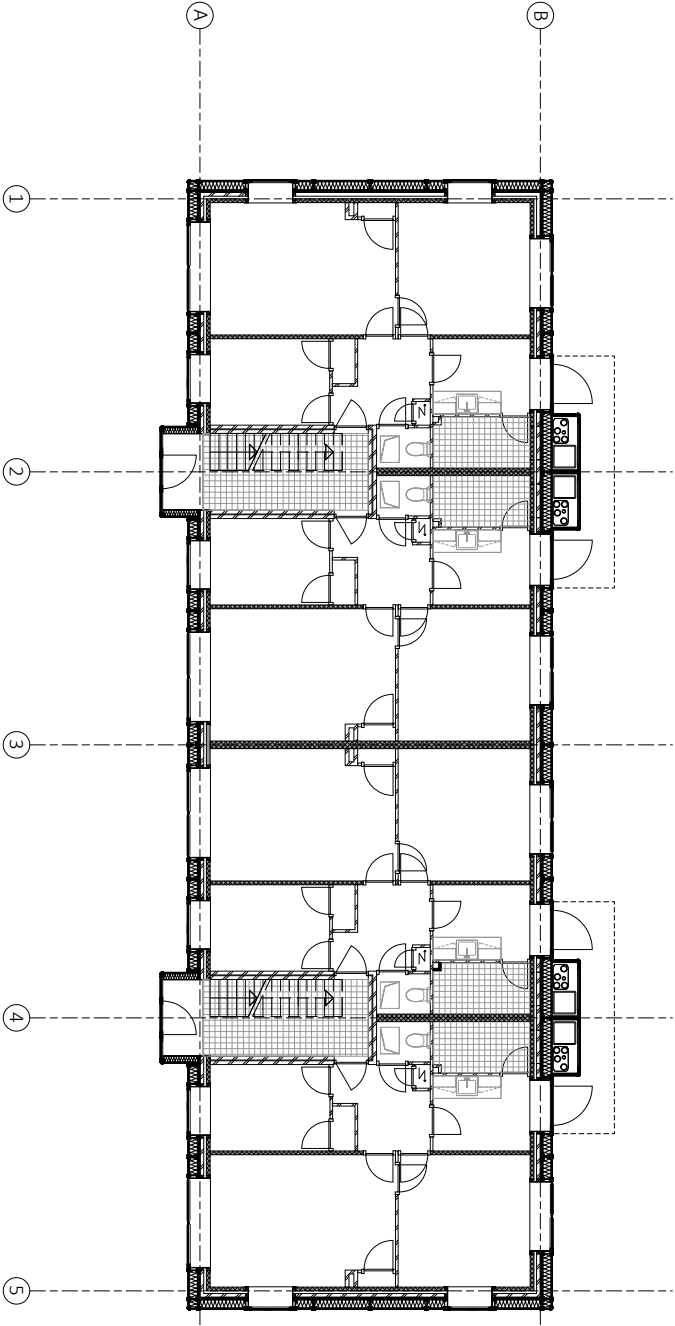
Plan | 1:200 | Ground Floor (own illustration)
